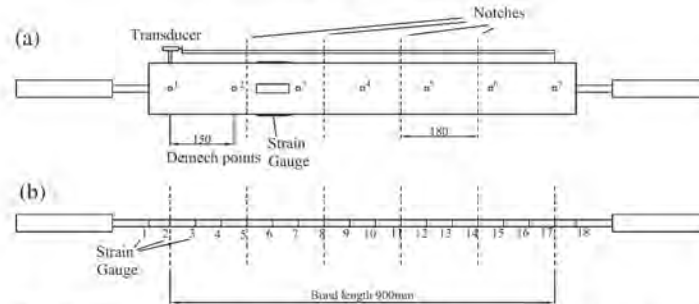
(a) External instrumentation of the concrete specimens, (b) Internal instrumentation of the GFRP reinforcing bar.
